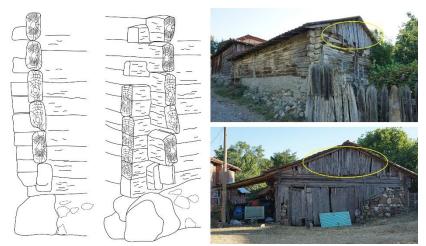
The joint detail of the kurtboğaz technique and the covering of the front wall with vertical wooden timbers
